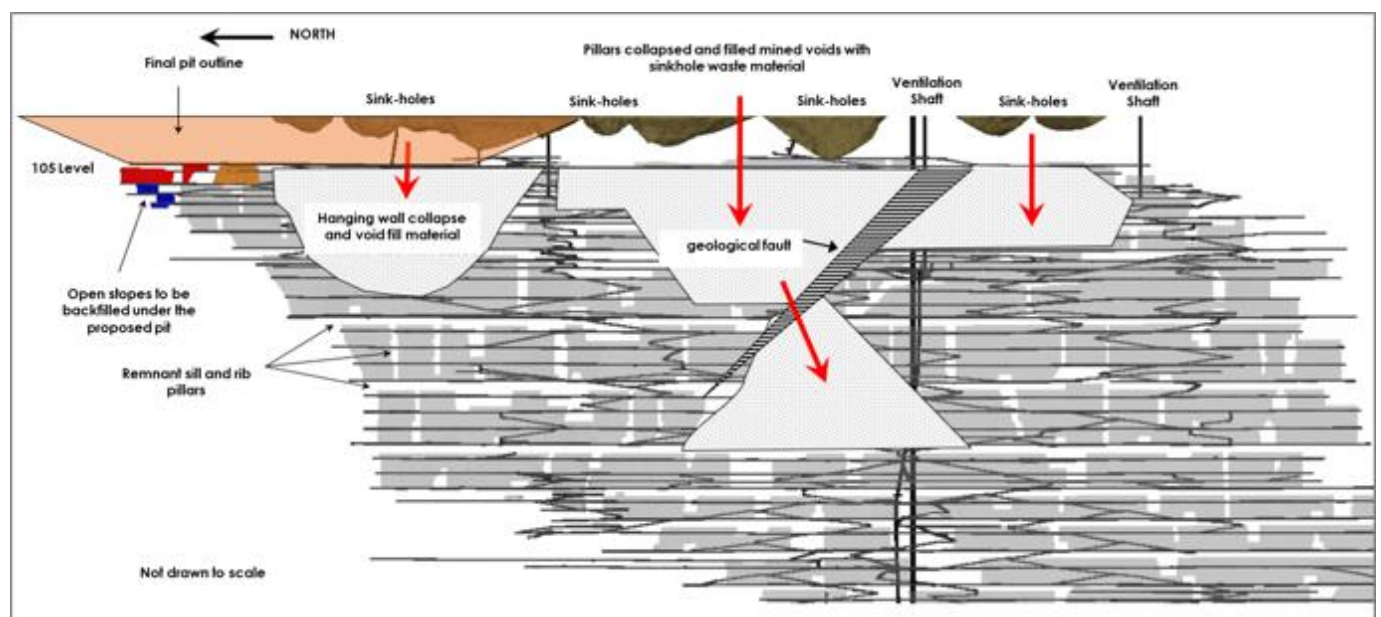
Longitudinal section showing location of proposed open pit and voids.
